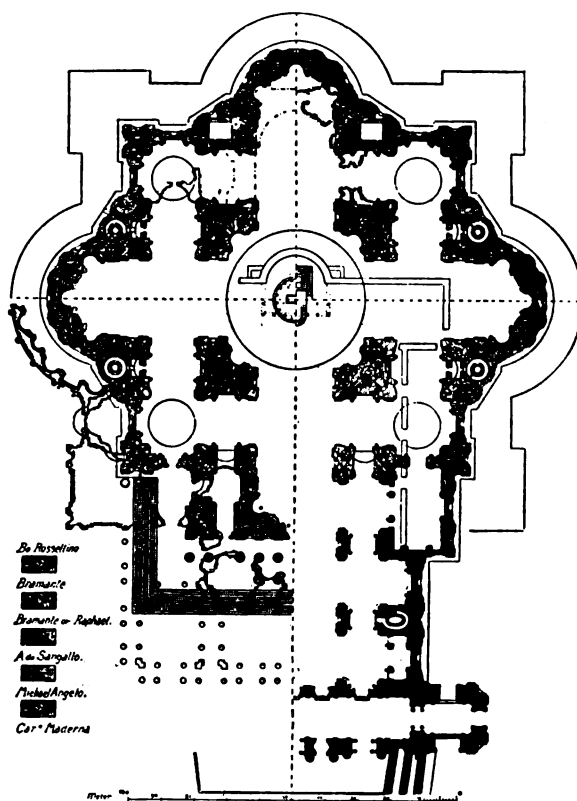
EXPLANATORY GROUND-PLAN OF ST. PETER'S
